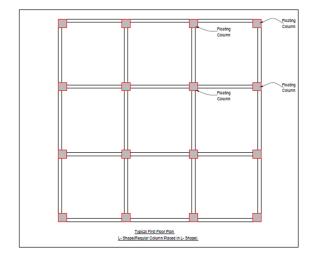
Typical First floor plan of L-shape (With Floating Column)
